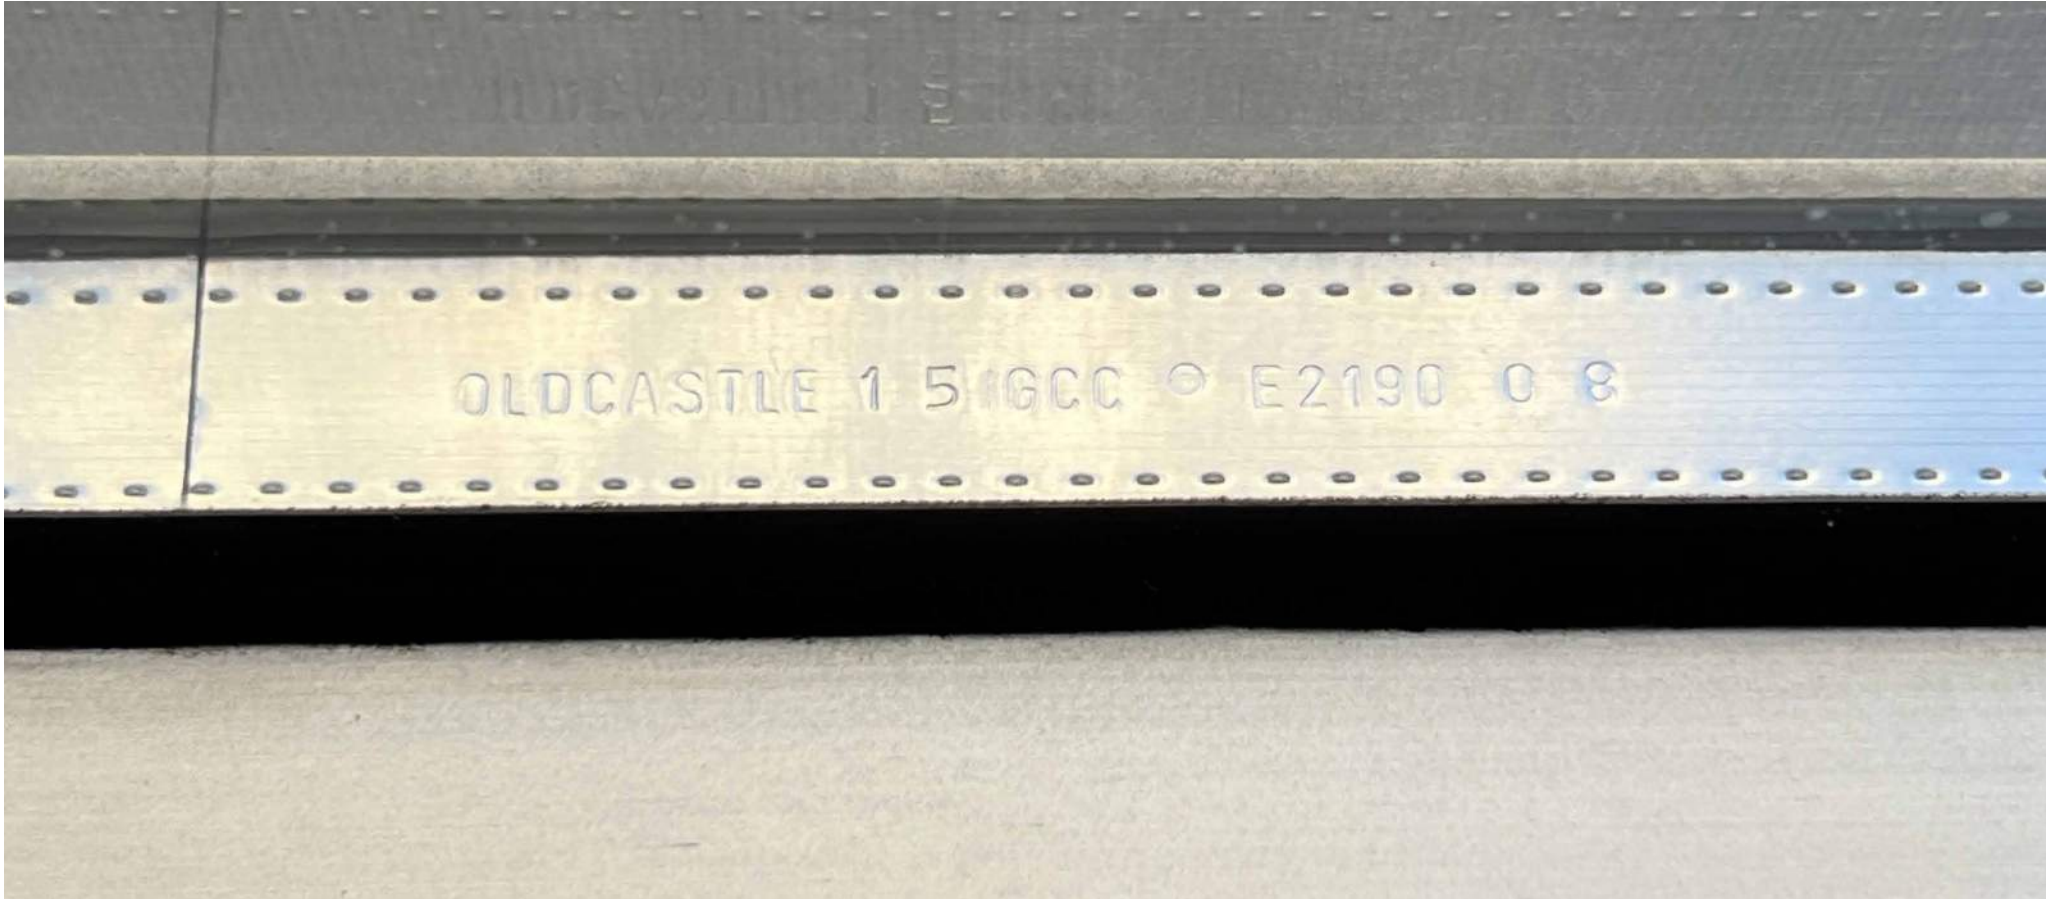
PHOTOS OF EXISTING INSTALLED WINDOWS SUPPORTING LEGALIZATION OF WINDOWS:
